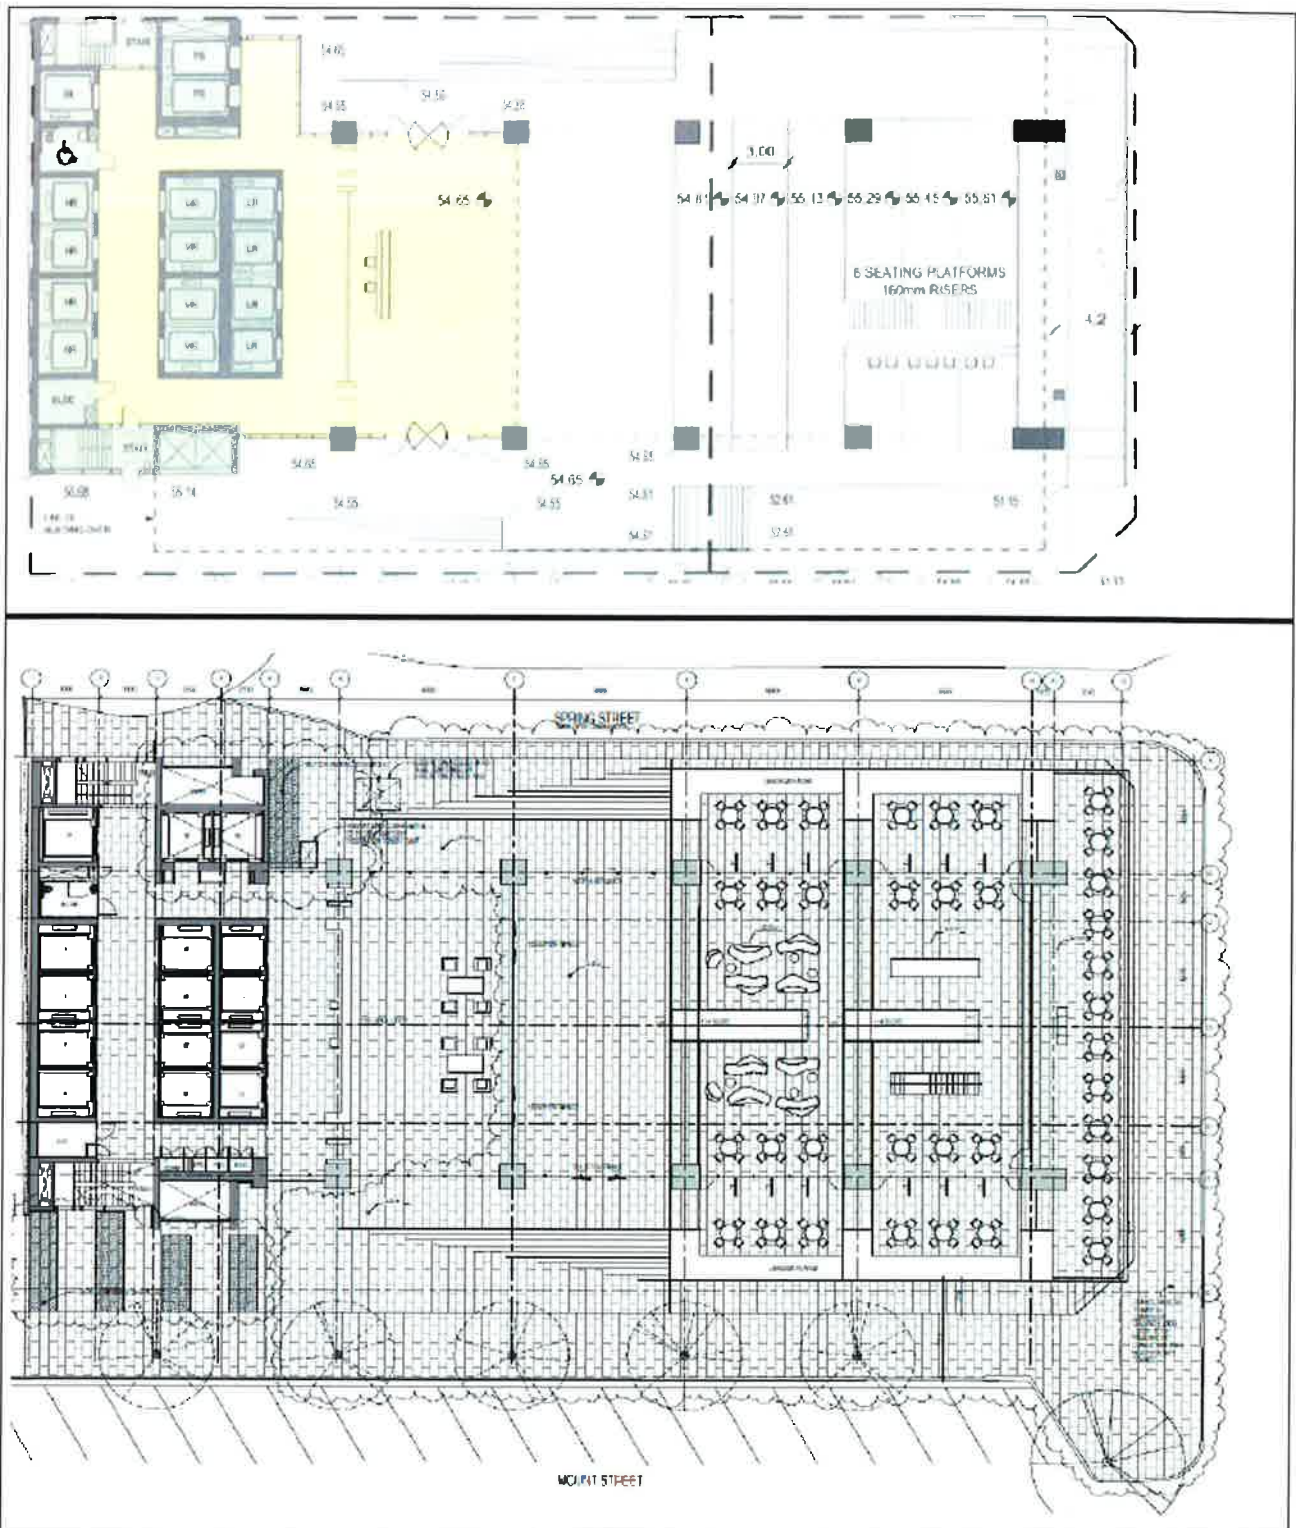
Comparison of approved ground floor (above) and proposed ground floor (below) layout.
